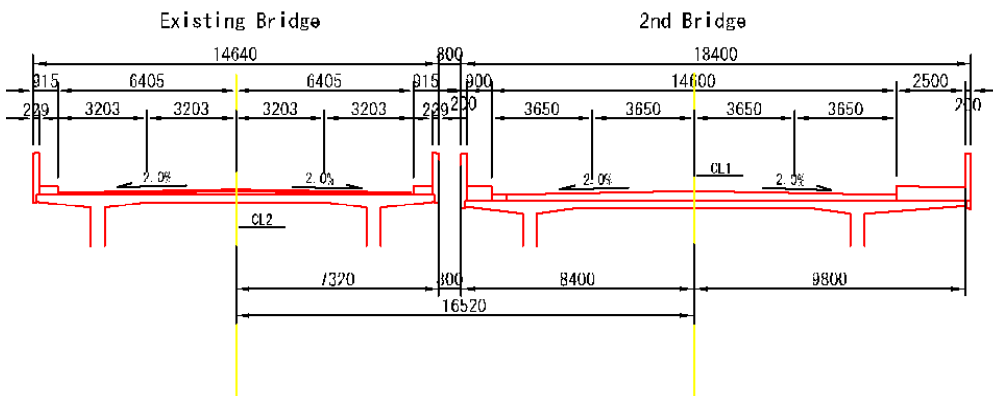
Typical Cross Sections of New and Existing Kanchpur Bridge
